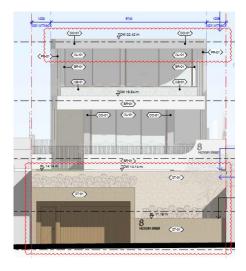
Proposed front elevation - 8 Victory Street, Clovelly (Source: BJB Architects Pty Ltd)
